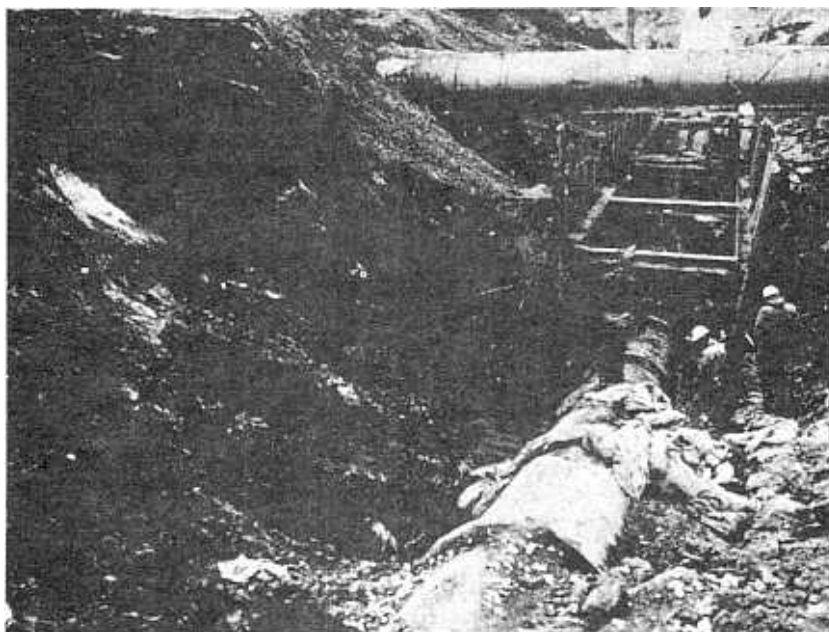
Failure of bank and liquefaction of foundation in construction excavation caused by improper control of ground water in fine sandy soils.
